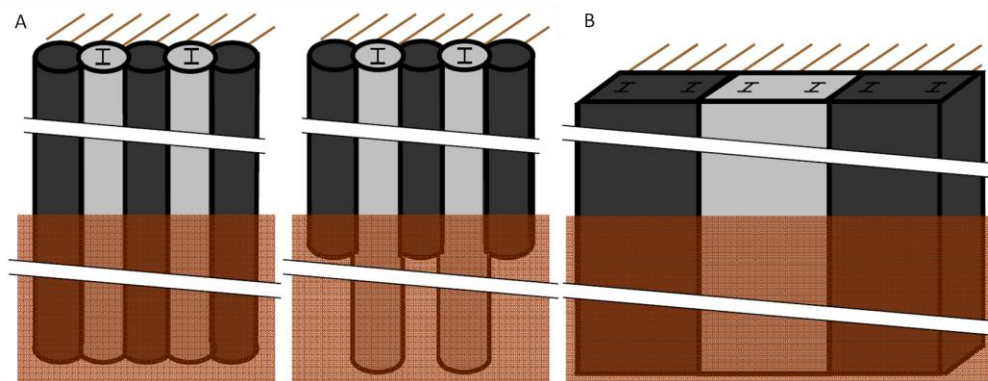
Schematic plan view of the secant execution of (A) cylindrical DSM columns and (B) rectangular DSM panels
